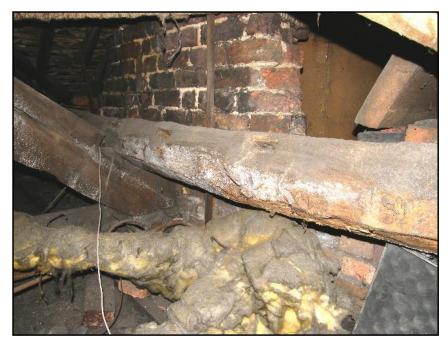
South Roof, north lower purlin with empty mortice holes indicating it is a reused timber, viewed looking northwest.
